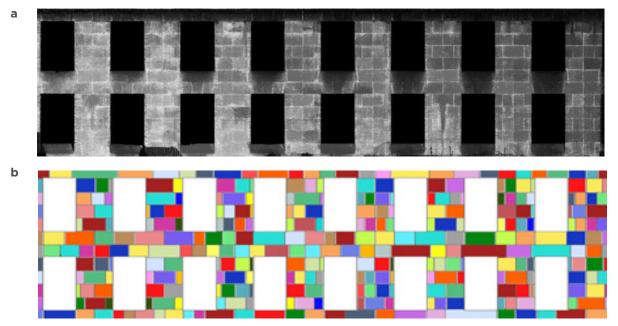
St Andrew's House south-eastern façade. 15a) Lower section intensity map; b) segmented and labelled stones for the lower section of the wall.
